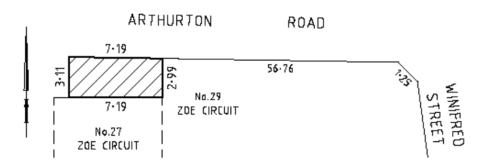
Title Plan road adjoining 27 Zoe Circuit, Northcote.
